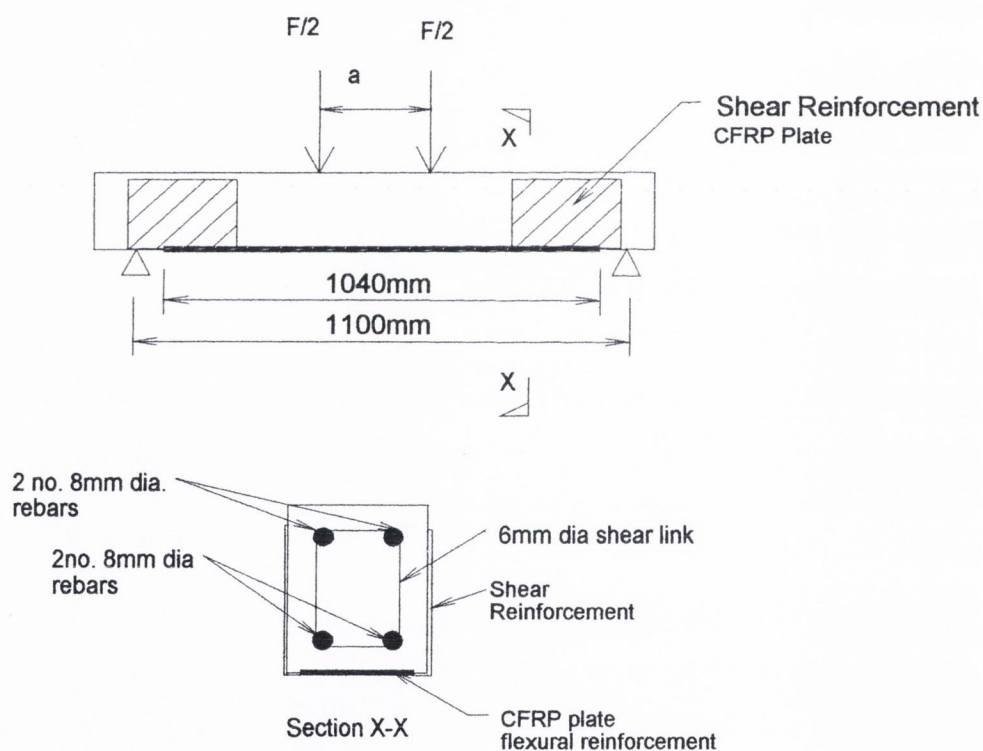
The four-point loading system together with a typical test beam section. 25mm minimum cover was provided for all reinforcement. (Li et al., 2001).
